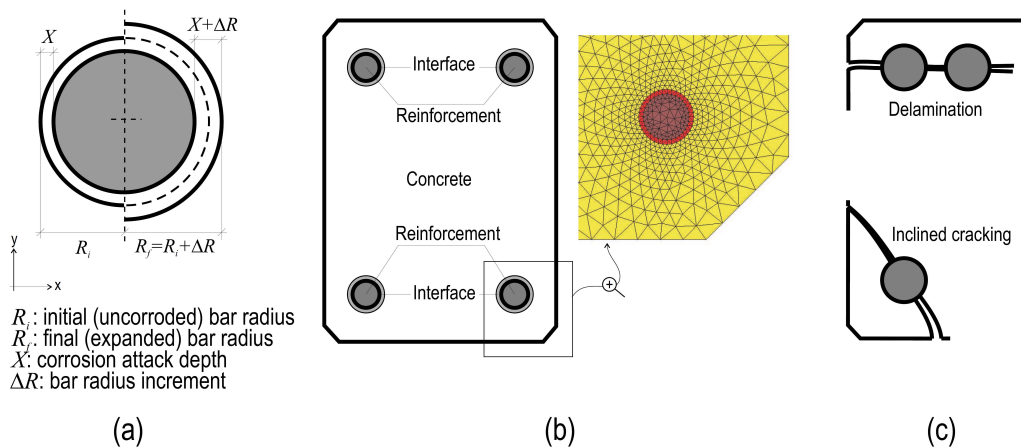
Plane strain 2D model: (a) Corrosion expansion mechanism. (b) Numerical model idealization. (c) Typical pattern of cracks. (adapted from Sánchez et al., 2008)
